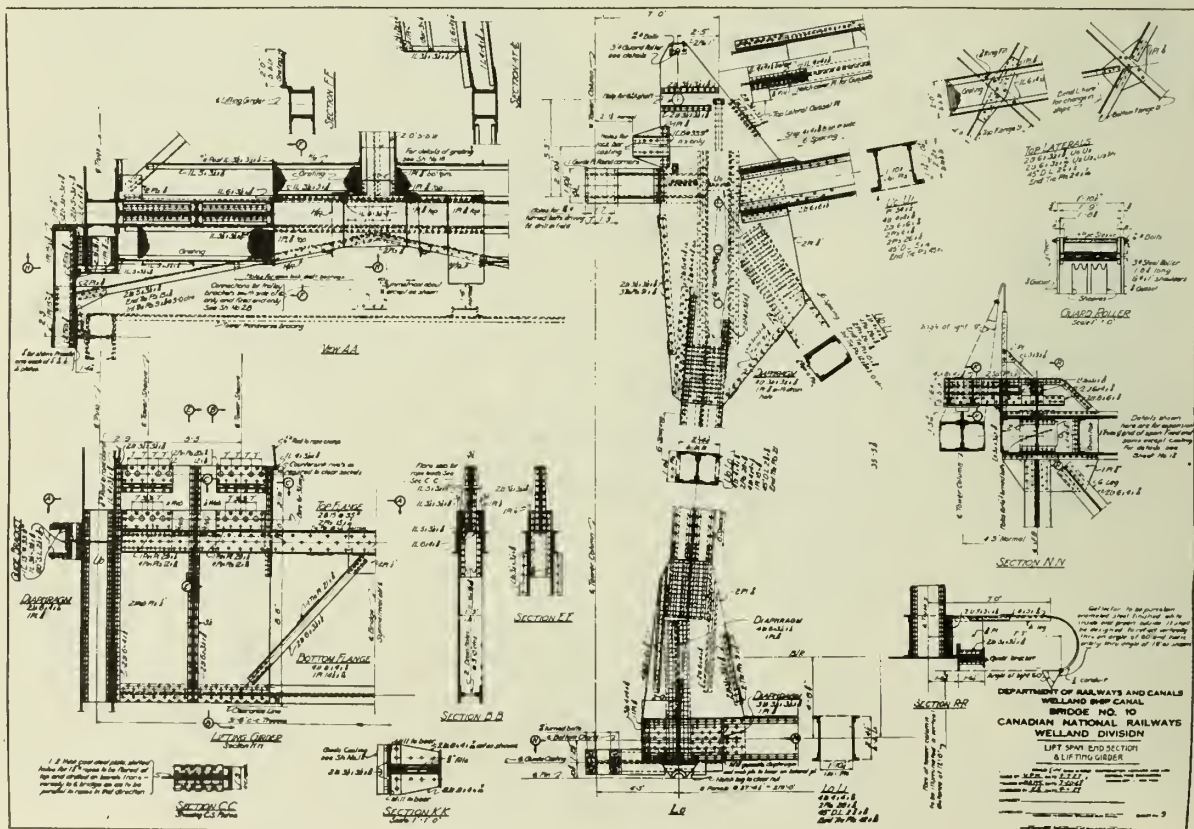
Bridge No. 10—Lift Span, End Section and Lifting Girder.
